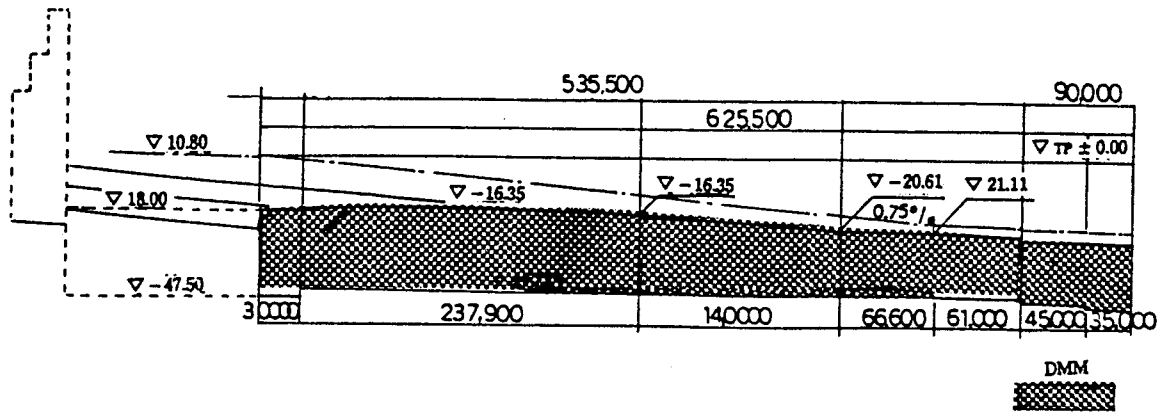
Elevation view of DMM execution area (Unami and Shima, 1996).
